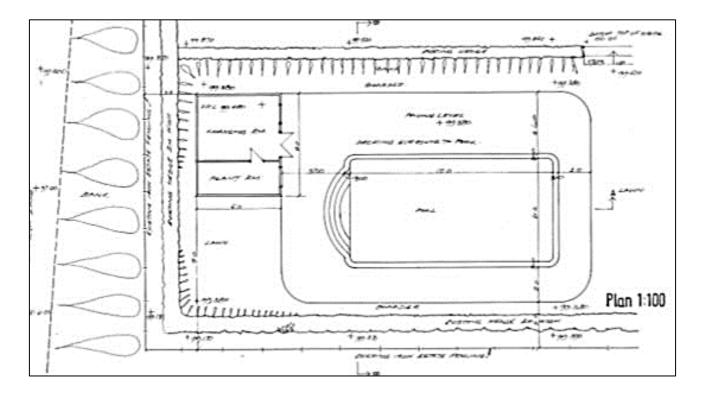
Plan of proposed swimming pool and outbuilding, north to bottom. Plan supplied by client,
